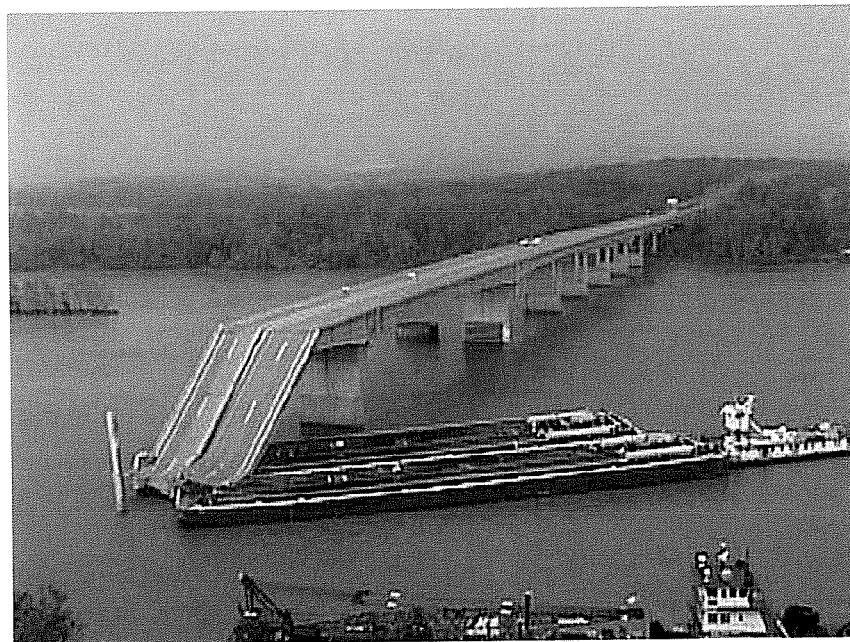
Webbers Falls, OK I-40 Bridge Damage
